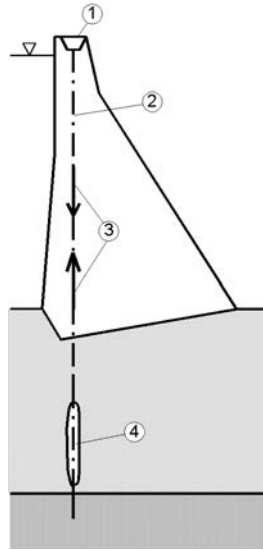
Strengthening of the dam by means of vertical prestressing. (1) Anchoring at the crest; (2) prestressed cable in the hole; (3) prestressing force; (4) grouted anchorage in firm rock.
